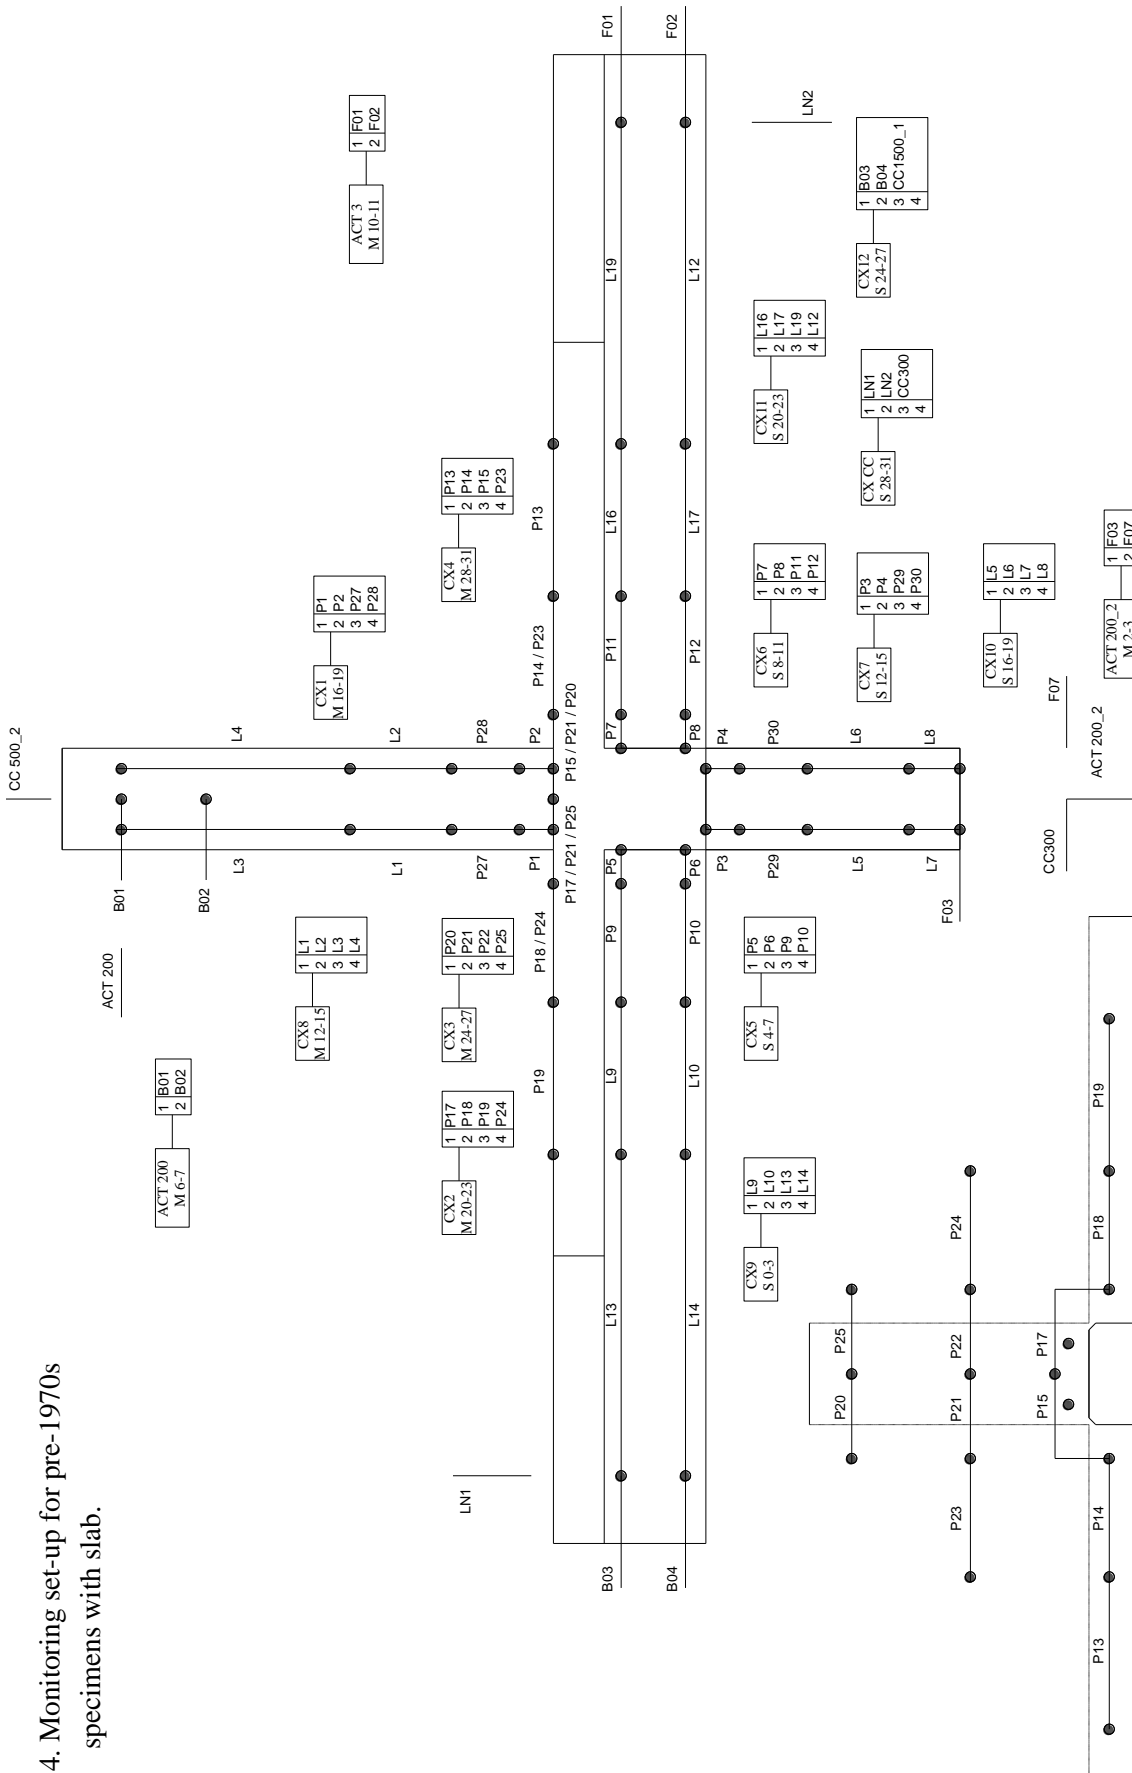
General arrangement of monitoring equipment for the beam-column joint tests.
